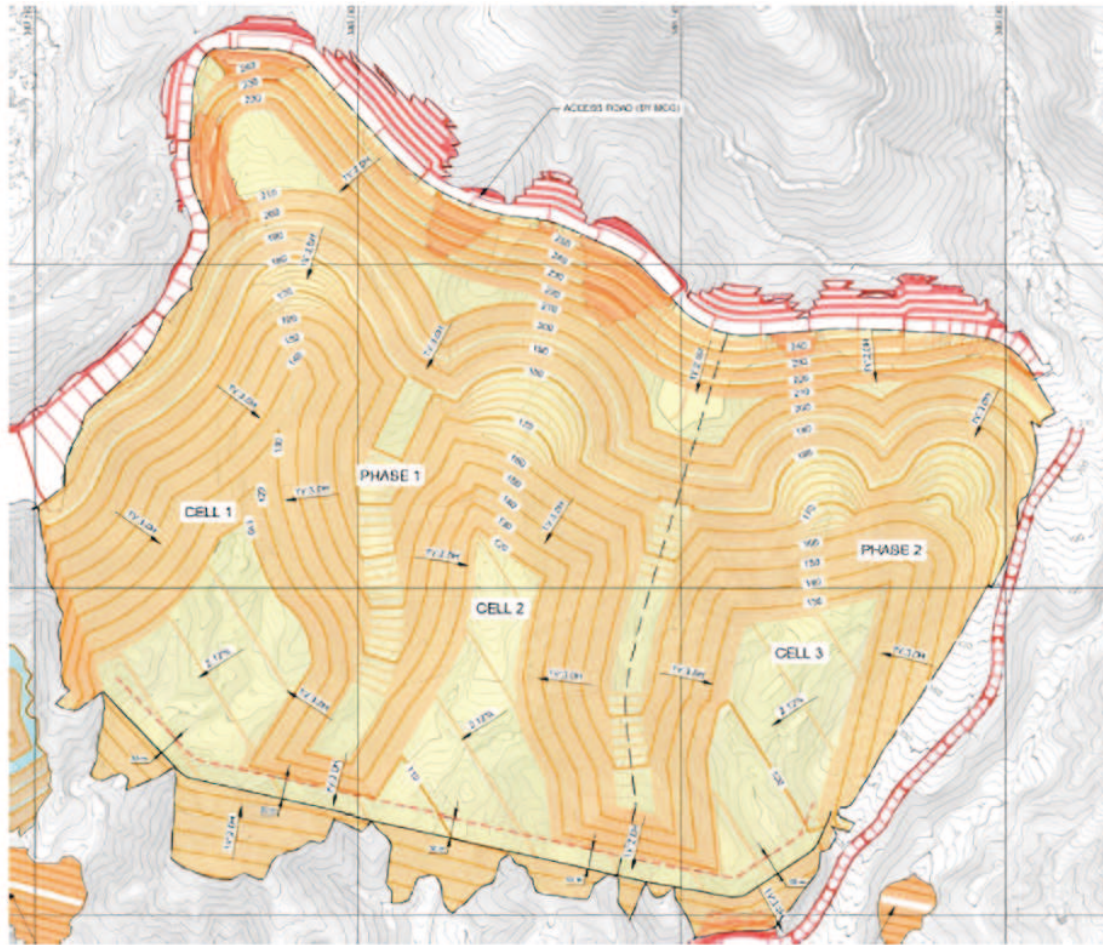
Heap Leach Facility Proposed Construction Stages
